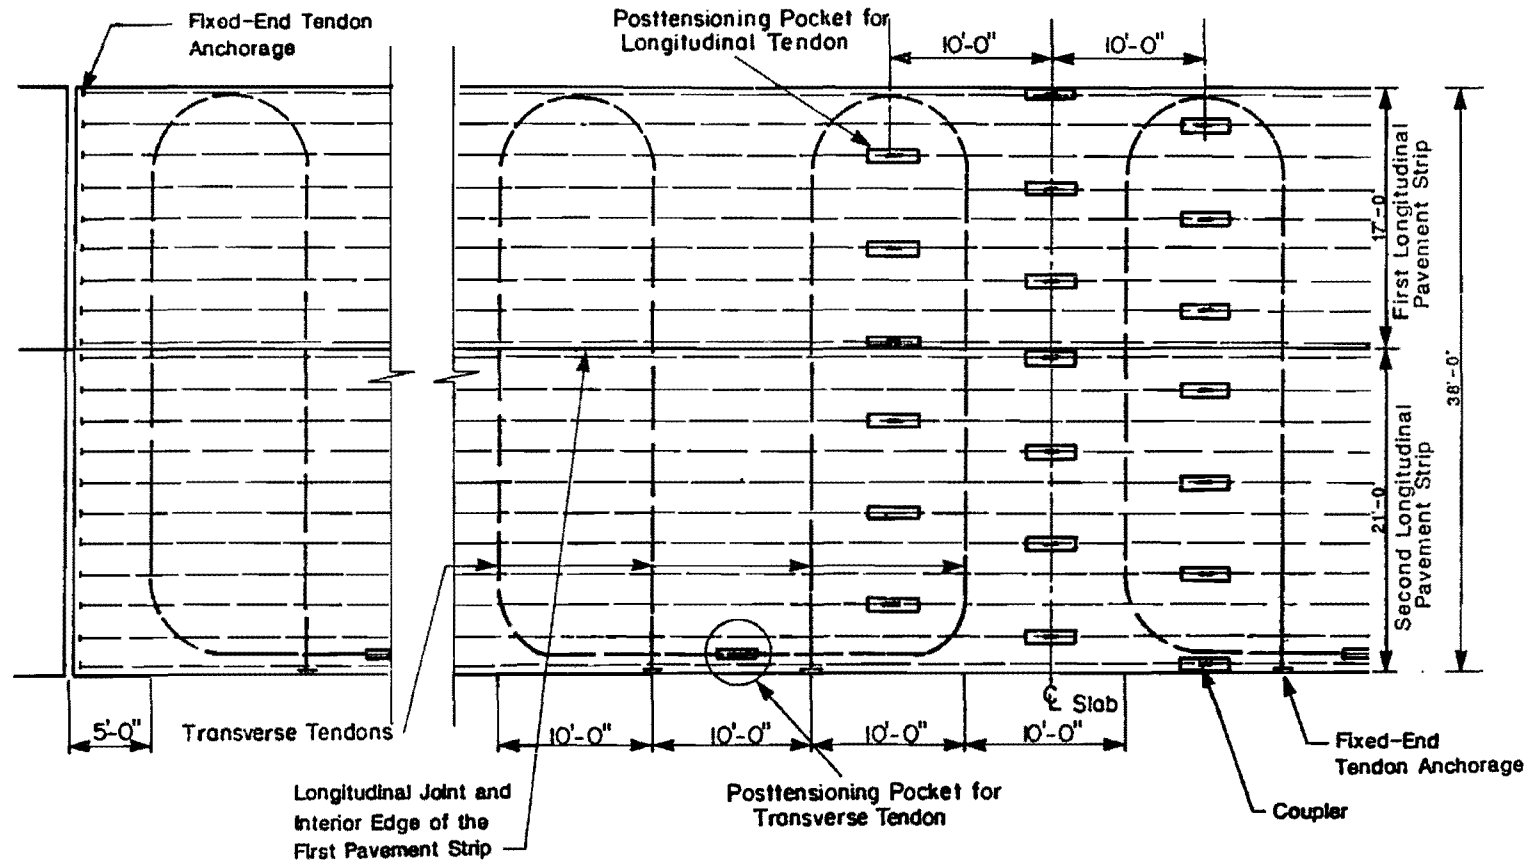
Plan view of the proposed pavement developed by the Project 401 staff.
